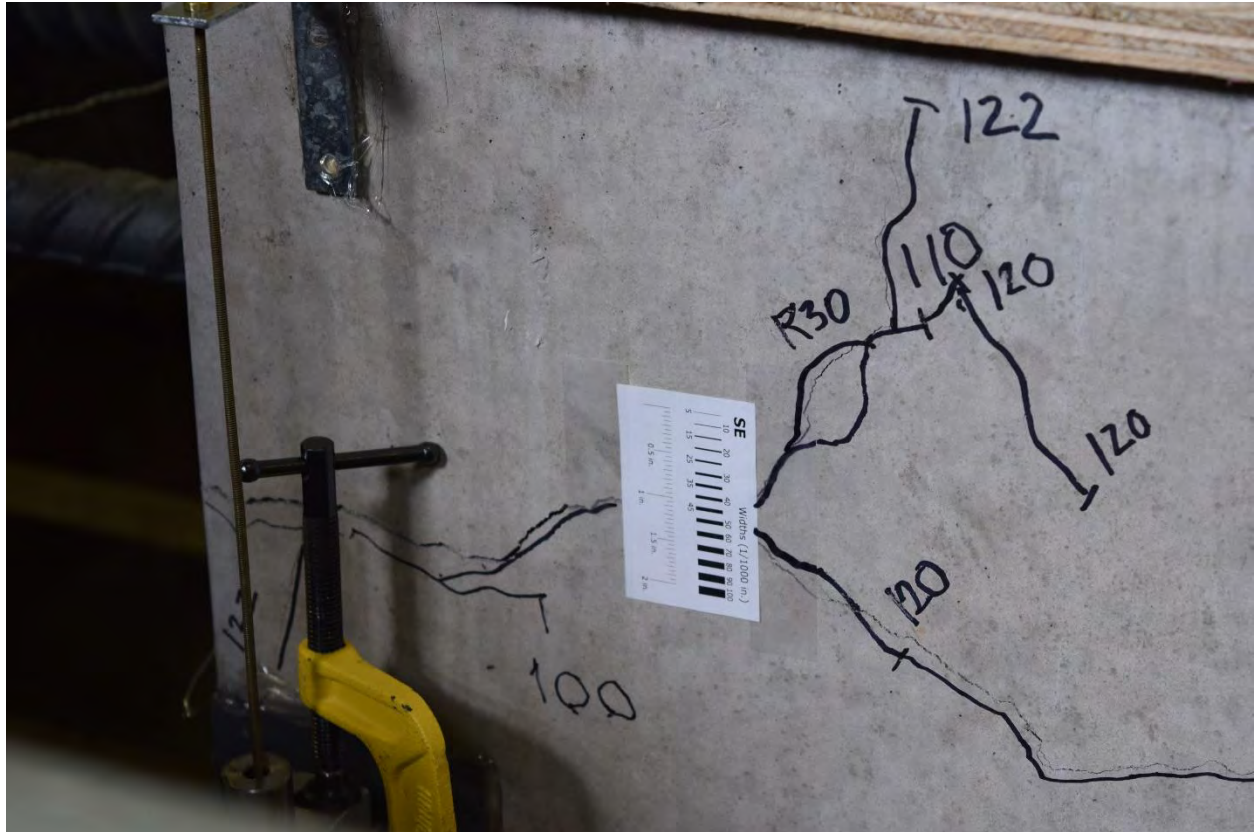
Test Photo Specimen D1, SE corner, 108 kips
